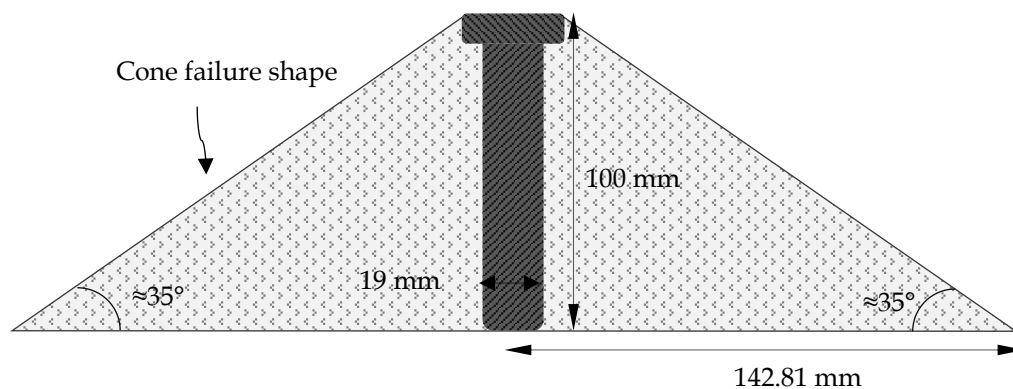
Possible shape of concrete cone failure in concrete breakout condition
